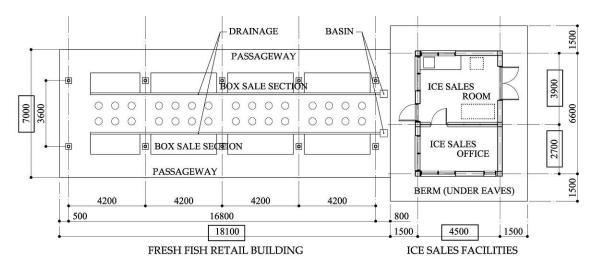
Overall Floor Plans of Fresh Fish Retail Building and Ice Sales Facilities
